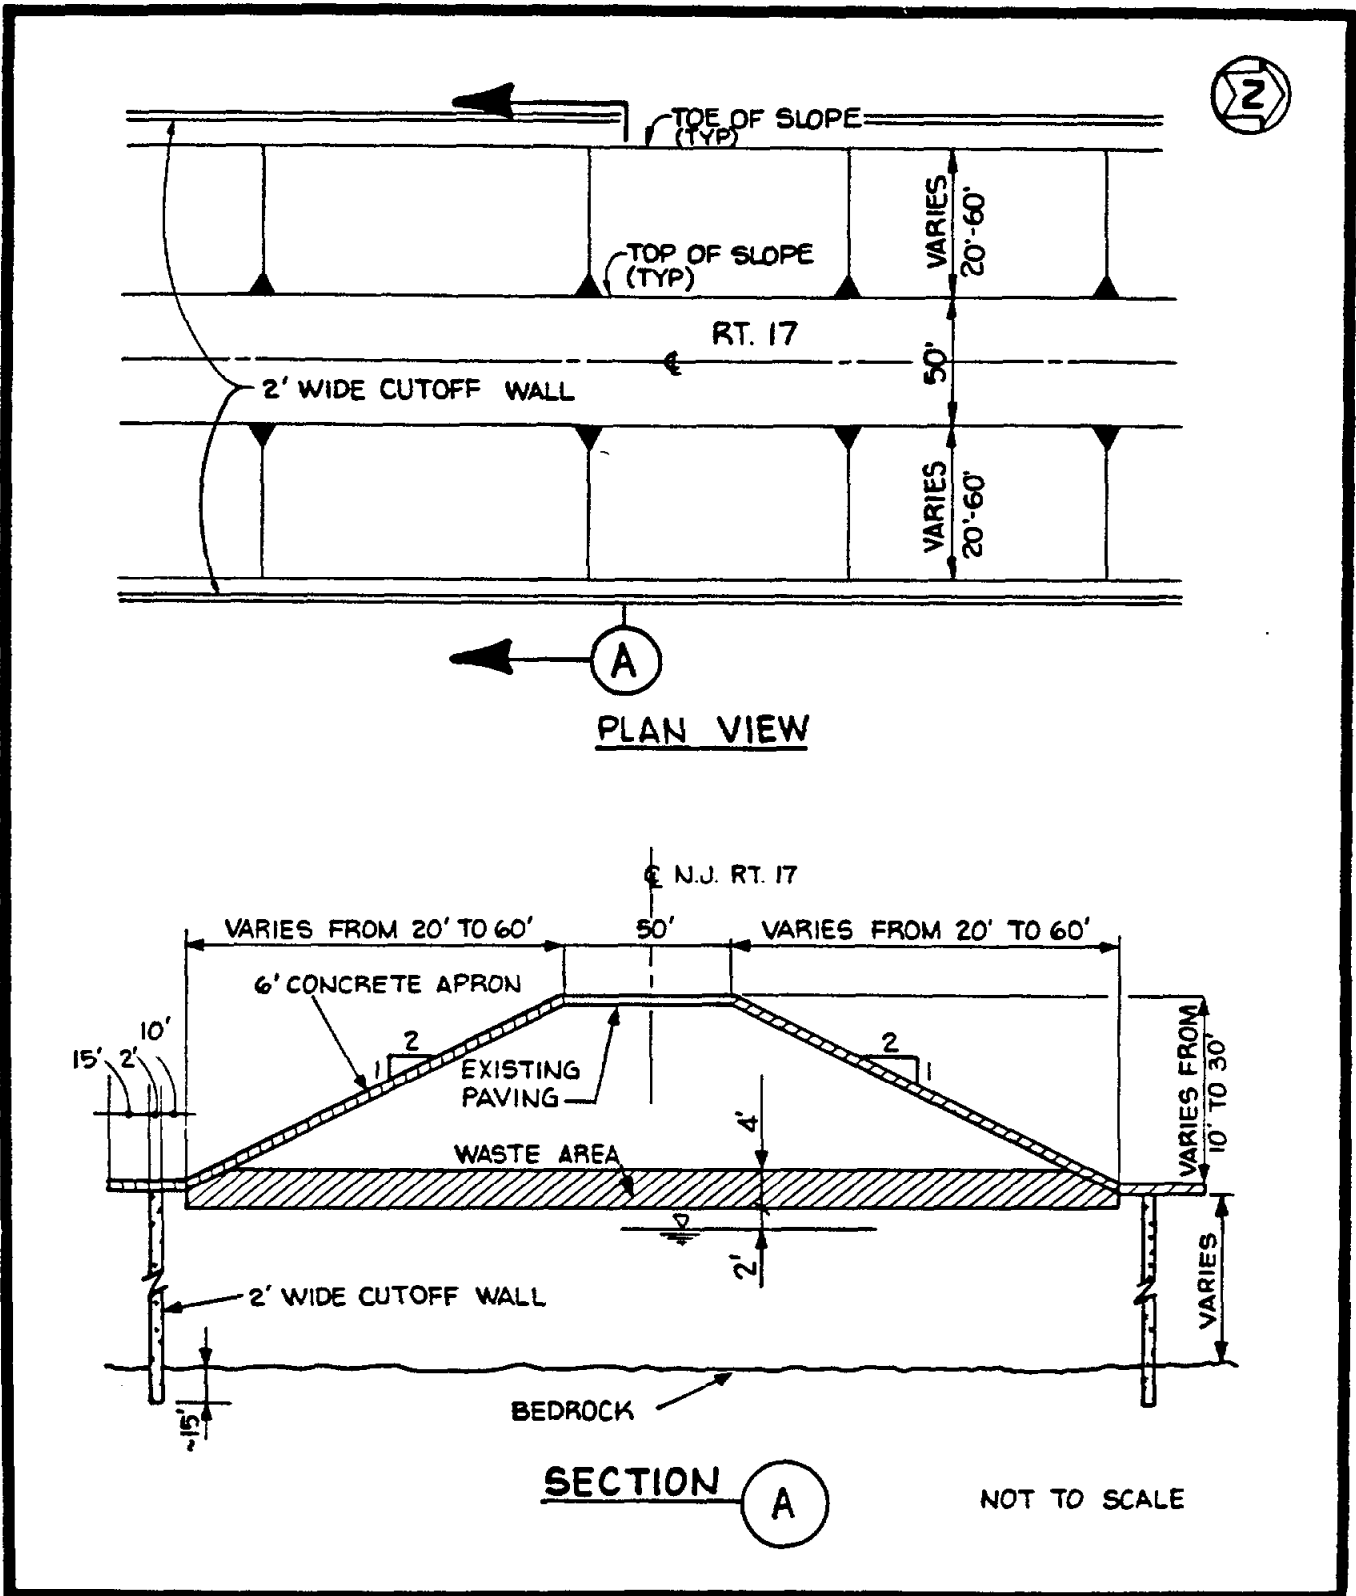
CONTAINMENT OF RADIOACTIVE CONTAMINATION UNDER ROUTE 17 USING A CUTOFF WALL
